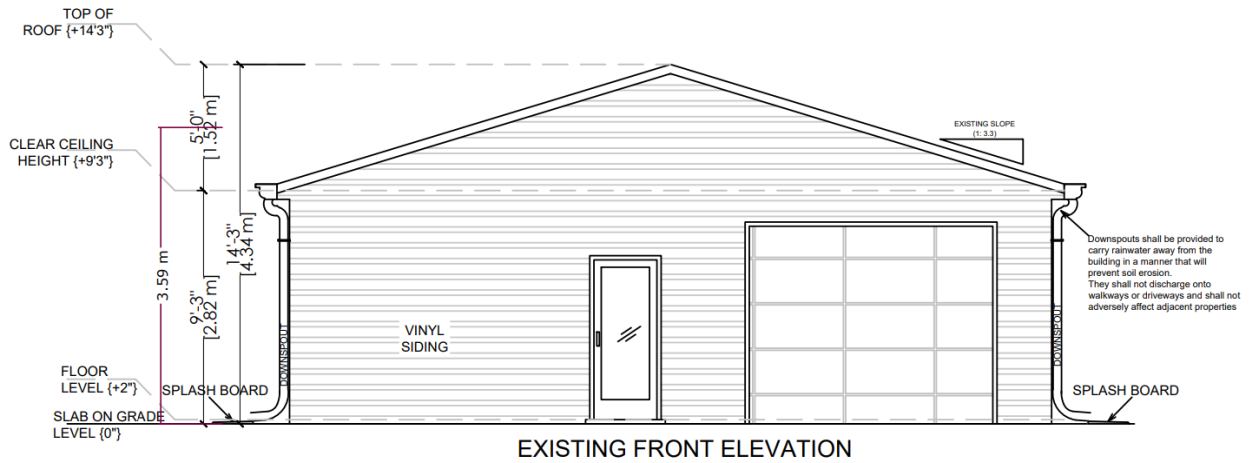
Front Elevation of Existing Garage (Proposed ADU)
